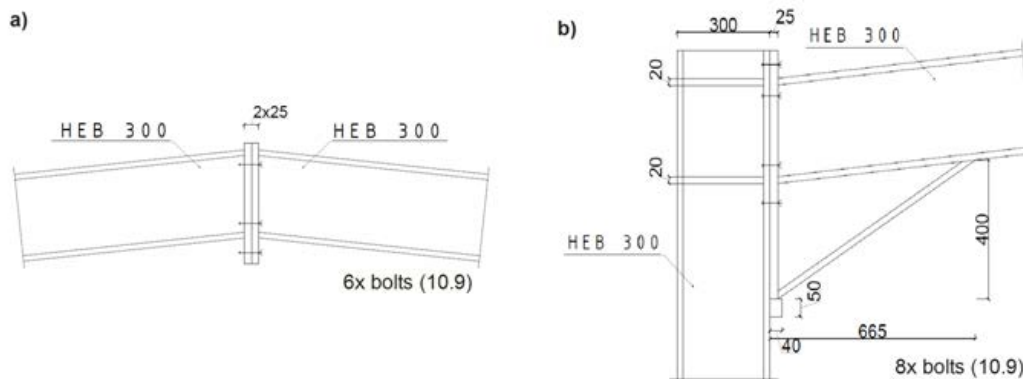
Details and dimensions [mm] of: (a) bolted apex connection between rafters in the roof ridge, (b) end-plate joint connection between the column and the rafter
